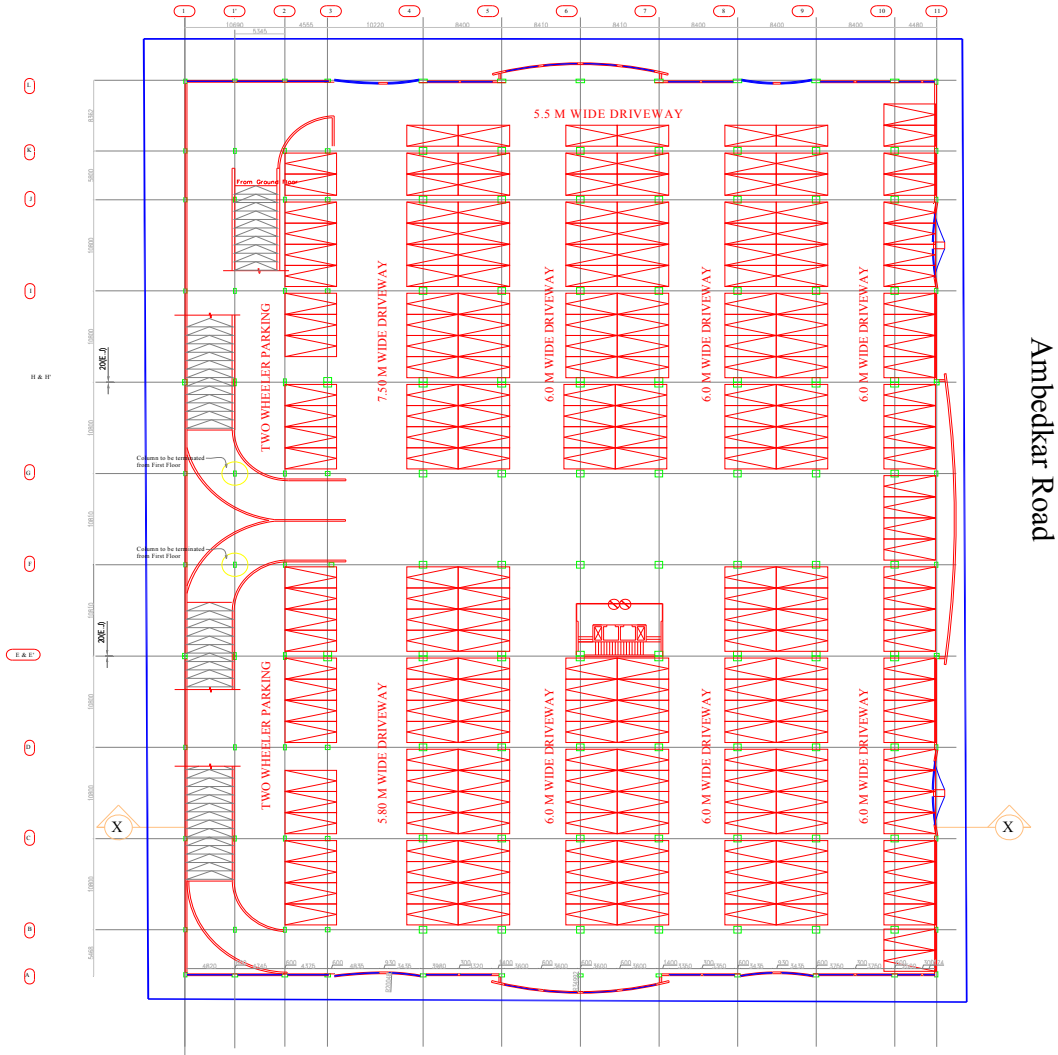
Typical Floor Plan of the Proposed Multilevel Parking Facility
